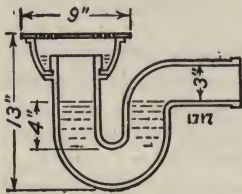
A typical floor drain and trap with 4-inch water seal.
